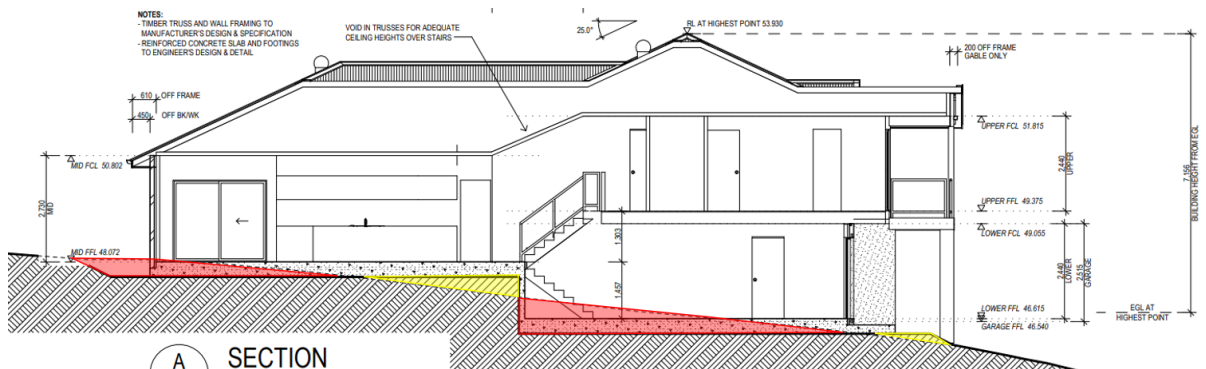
Annotated Section A detailing in red excavation and in yellow fill
